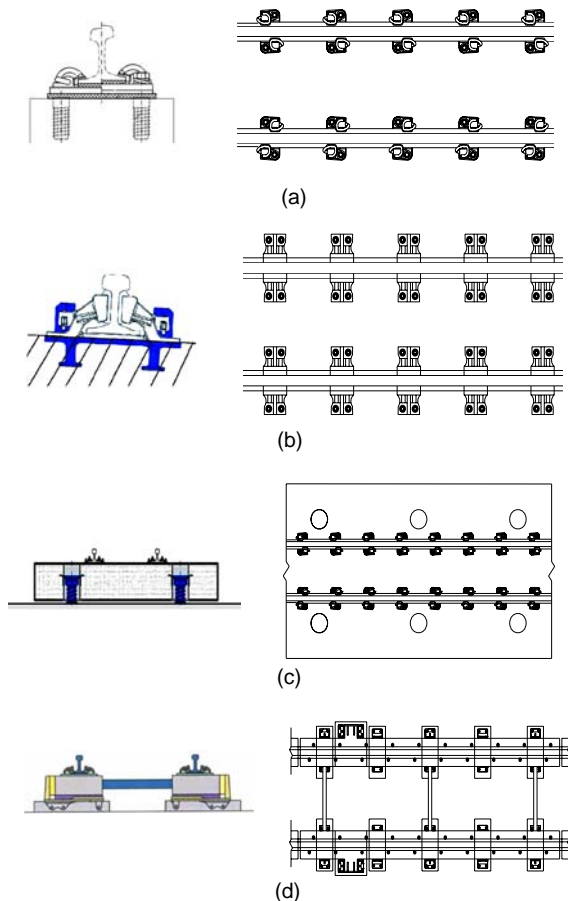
Cross-section (left) and plan (right) sketch of four kinds of track structures. (a) High resilience direct fixation fasteners; (b) Vanguard fasteners; (c) Floating slab track; (d) Floating ladder track
